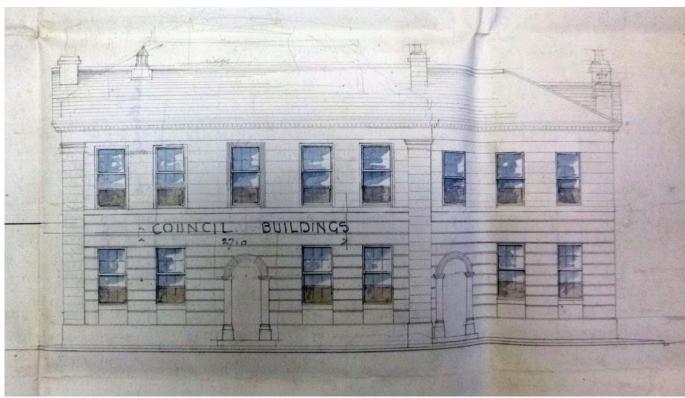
West elevation of the council buildings, dated c1903 (CAC(B) Z/1028/1 c1903)
